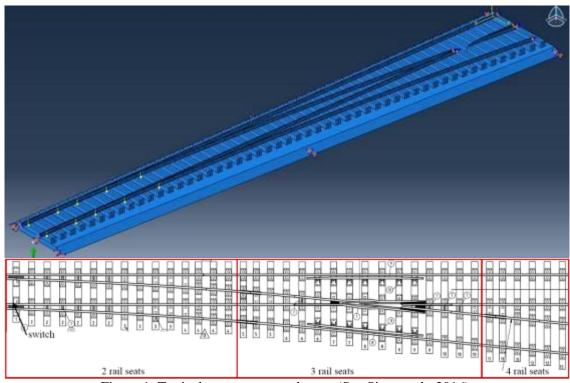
Typical turnout system layout (Sae Siew et al., 2016).
